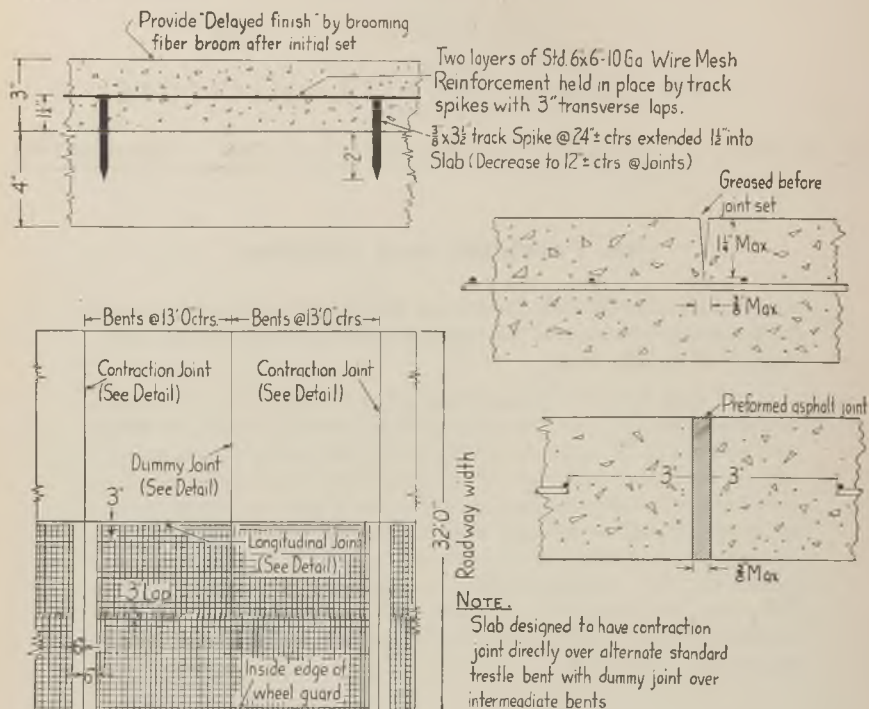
Three inch concrete deck slab on wooden trestle. The slab section is at upper left; deck plan, standard panel 16 by 26 ft., lower left; top right, detail of typical dummy joint; and typical transverse and longitudinal contraction joint at lower right.
